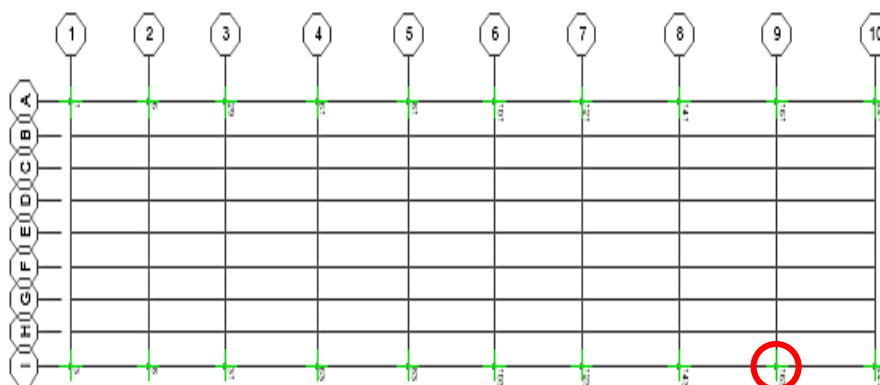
Gridline of chosen critical column of steel structure warehouse
